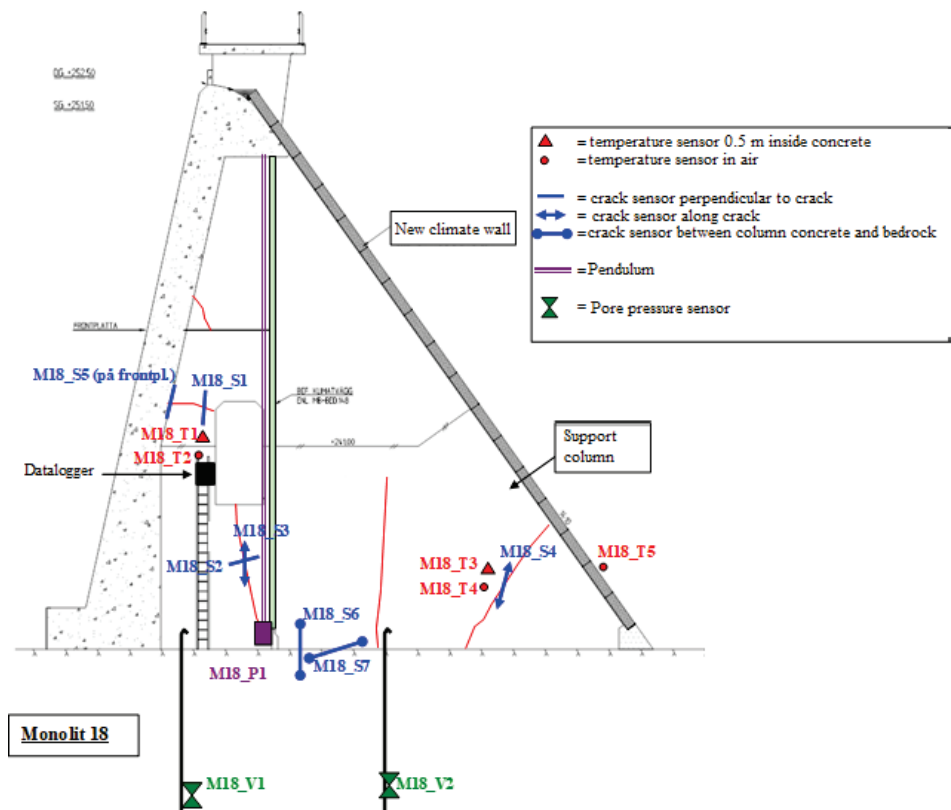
Measure: At non-overflow concrete dam monolith 18, new instrumentation with temperature sensors (2 inside the concrete and 2 in the air inside of new climate wall and 1 in the outdoor air), 7 crack sensors, 2 pore pressure sensors in the bedrock beneath the monolith and 1 pendulum at the crest. At non-overflow concrete dam monolith 38, new sensors like the ones at M18, but no pendulum and with 3 temperature sensors in the water at 3 different depths.
